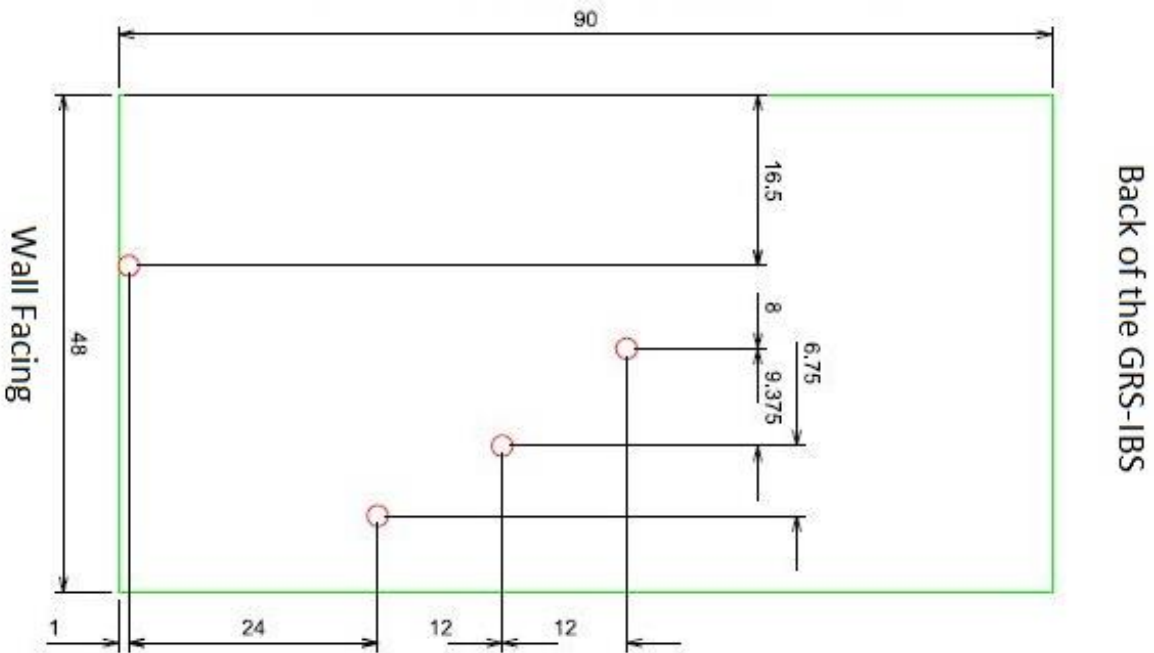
Plan view of WP connections to geotextile reinforcement at H = 75-inch above the foundation slab of GRS Abutment Models #1-#3 (dimensions are in inches)
